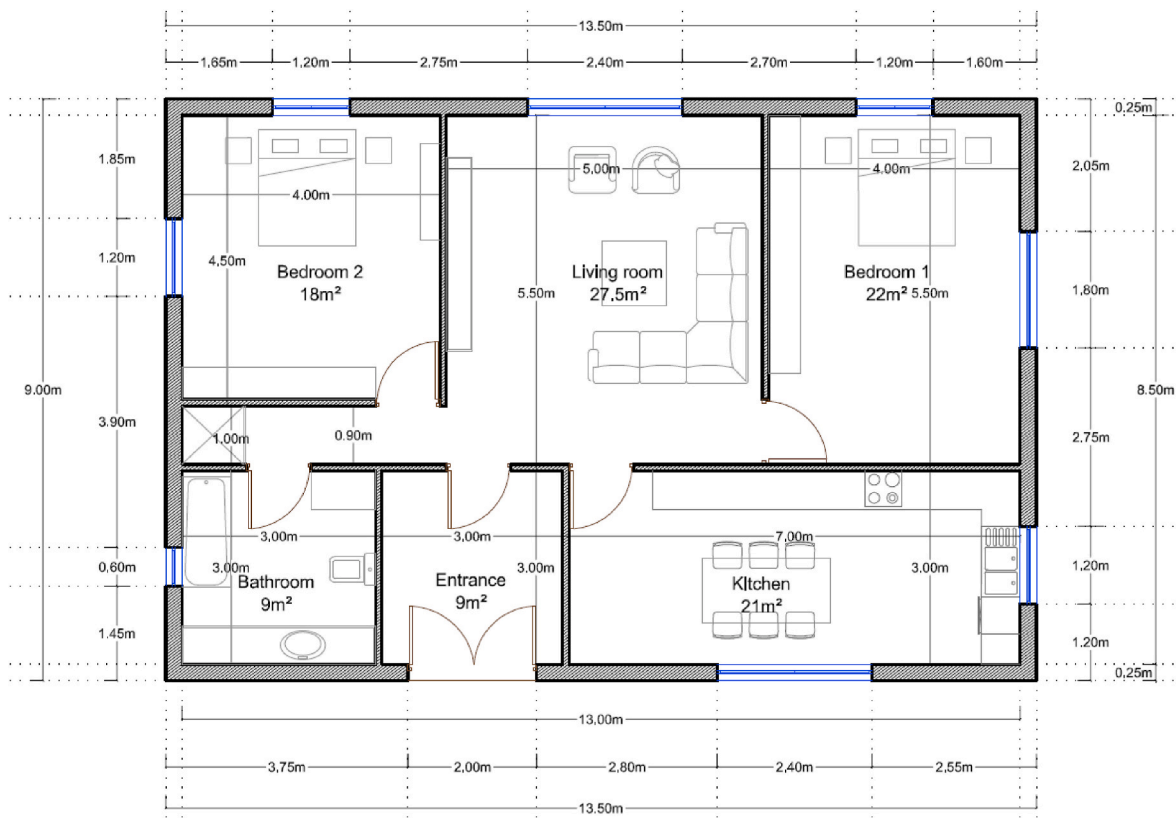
Building Type 6 - Southern Europe, Multi-family houses, 110 m<sup>2</sup>.
